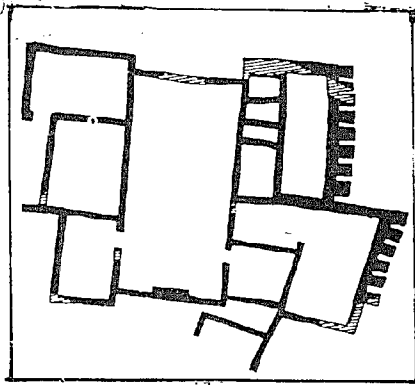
Plan of House at Tell 2, Telul el - Thalathat (after Egami 1959, Fig. 25 on pp. 88 - 89).
